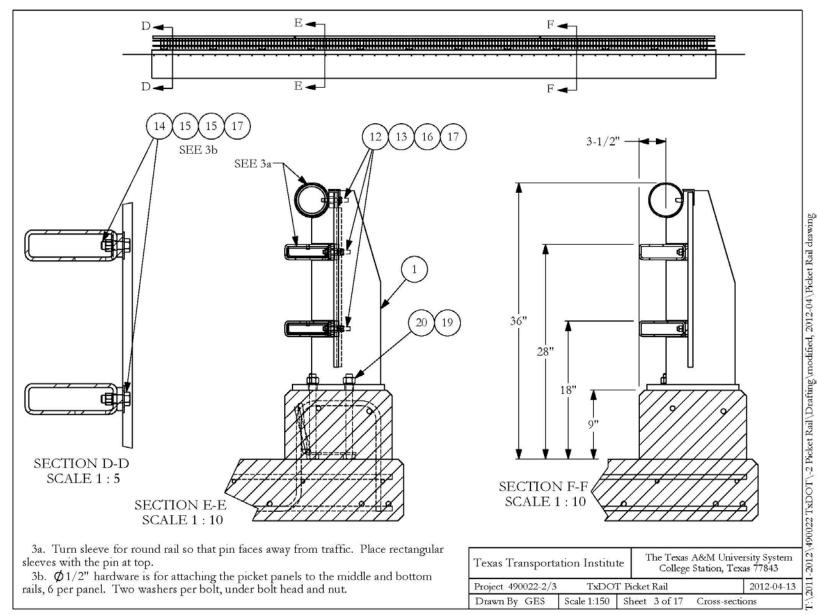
Cross Section of the TxDOT Picket Rail Installation.
